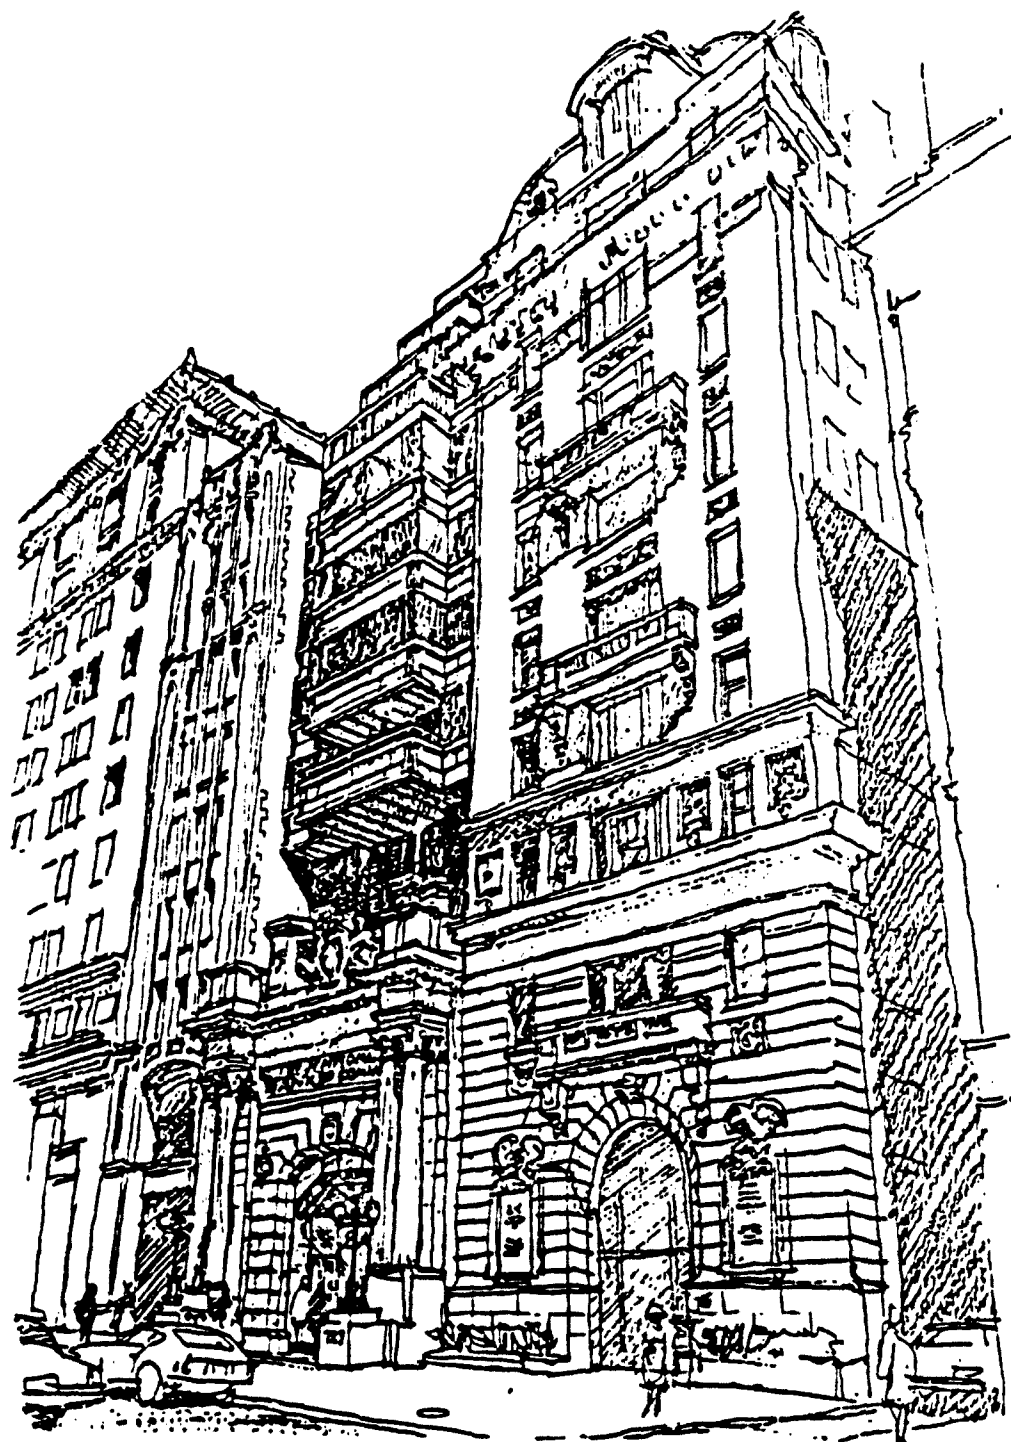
Architect's Sketch of Office Facade -- 727 15th Street
